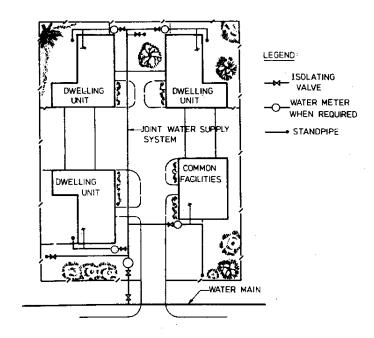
JOINT WATER SUPPLY SYSTEM
